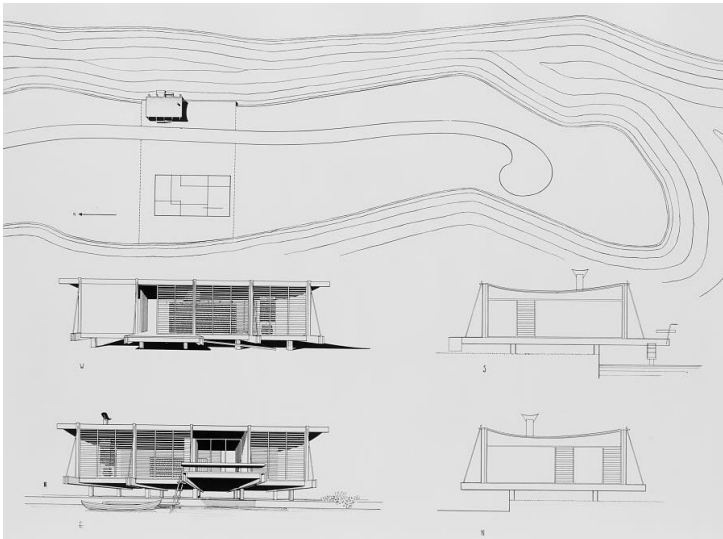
Paul Rudolph, *Healy Guest House, site plan and elevations*. 1950, Siesta Key, Florida.
